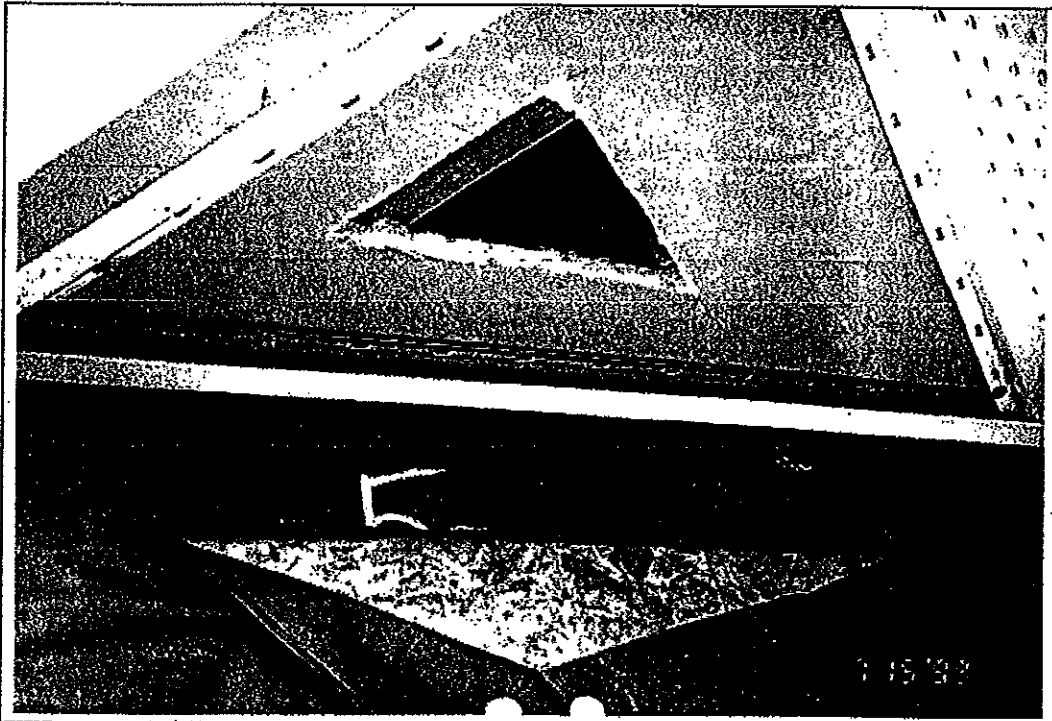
Exploratory opening no. 5, revealing the OSB sheathing and balcony components to be in good condition.
